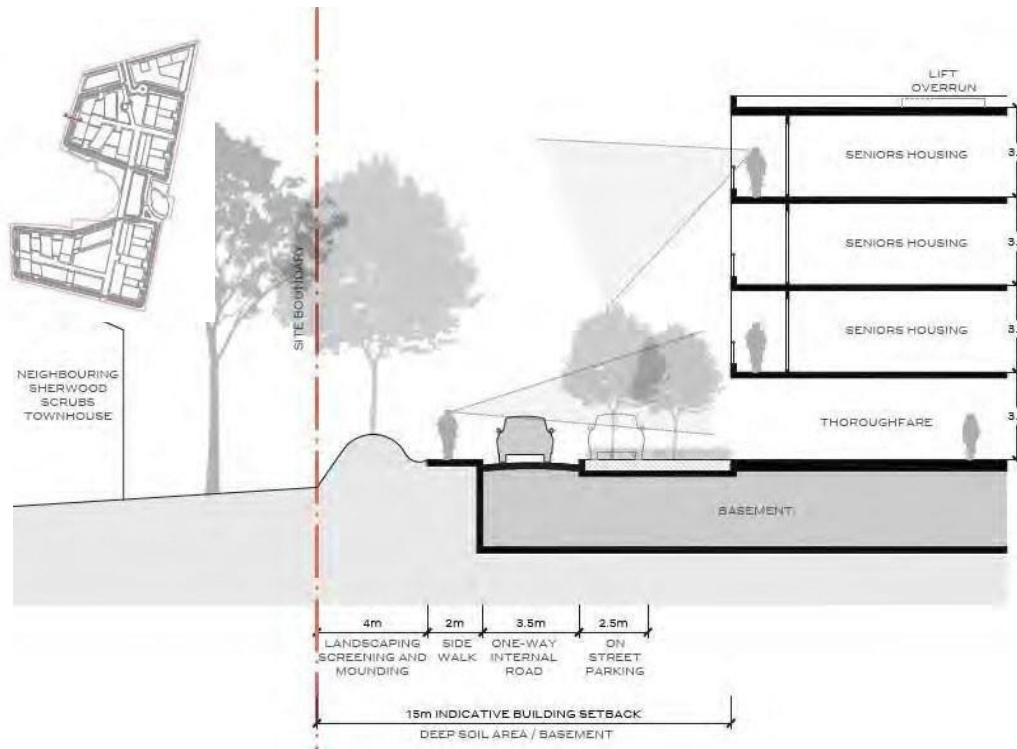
Indicative section from Sherwood Scrubs Townhouses to the west
